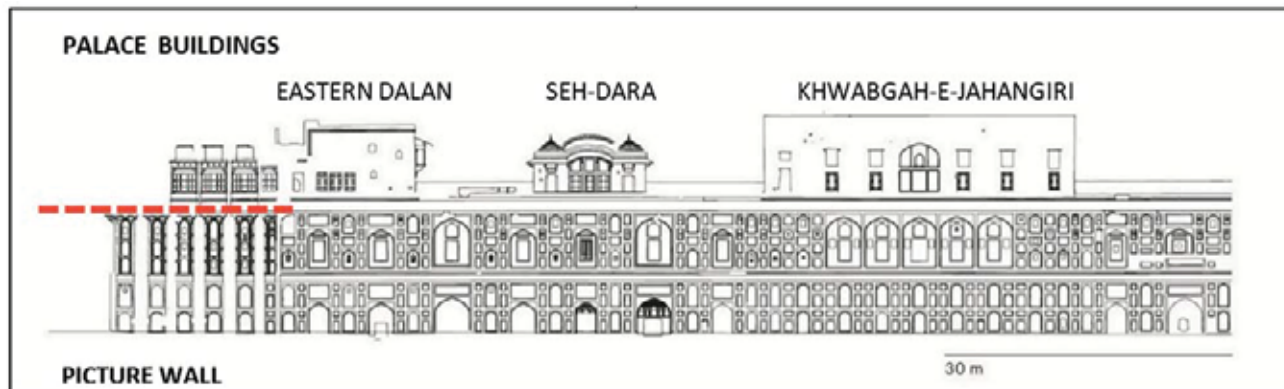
Elevation of the oldest part of the picture wall showing palace buildings on top and rows of pigeon houses on the walls below.
